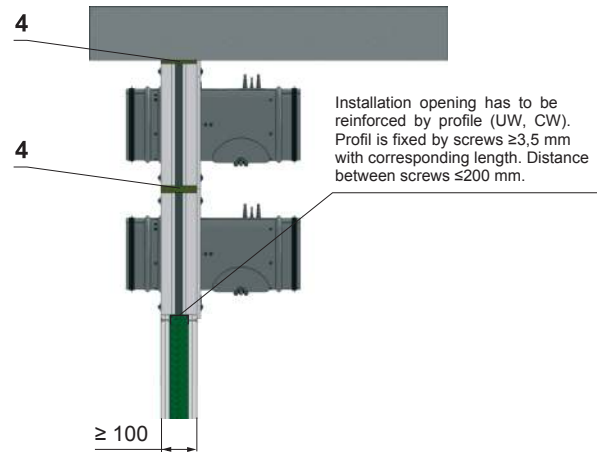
Gypsum wall construction - installation next to wall, ceiling - mortar or gypsum and mineral wool
